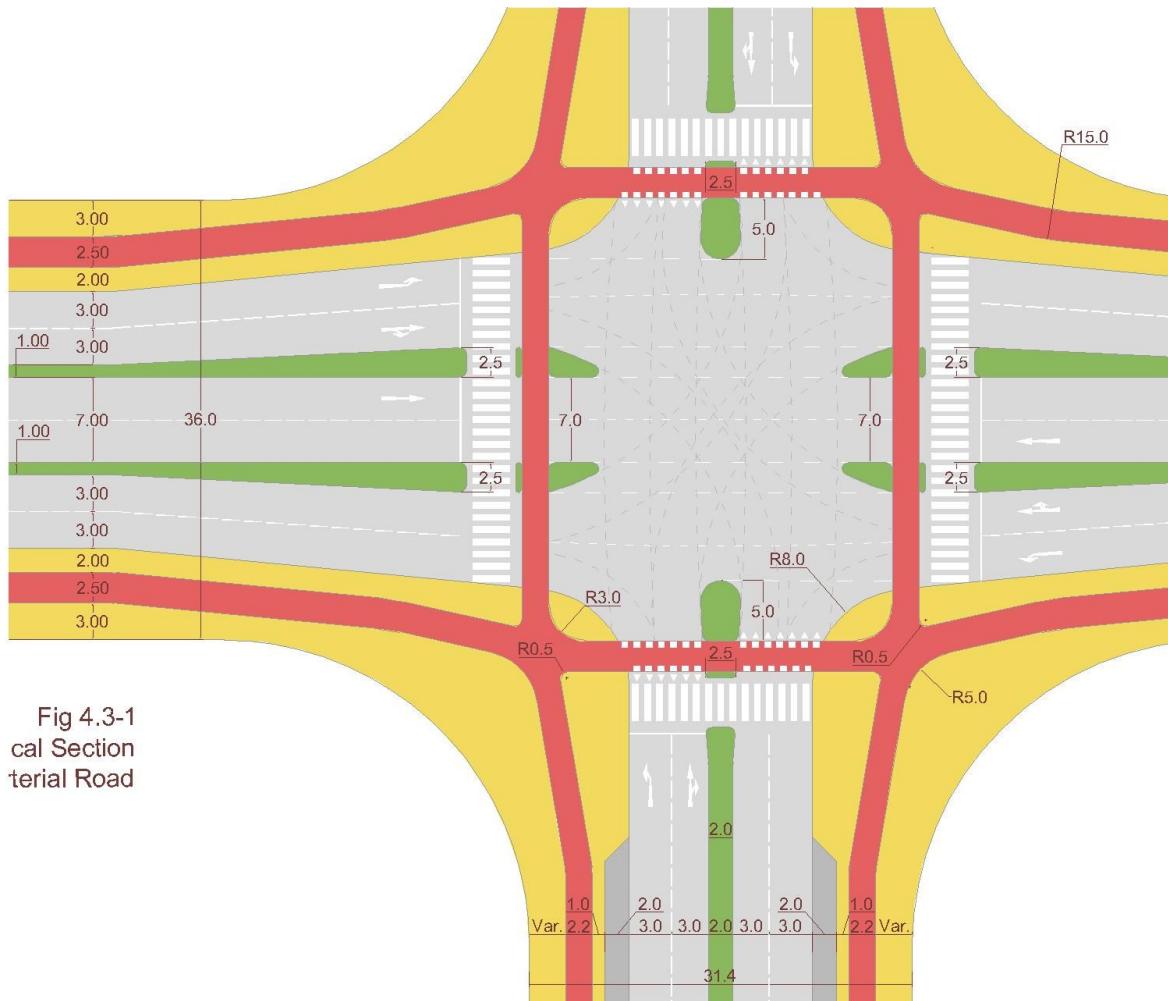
Intersection of a typical arterial road with central BRT-lanes and a typical sub-arterial road with parking
